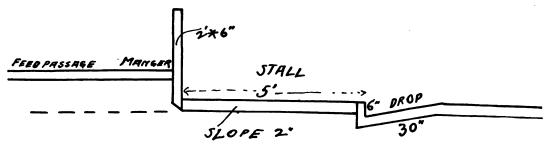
CONCRETE STALL FLOOR (SECTION).
